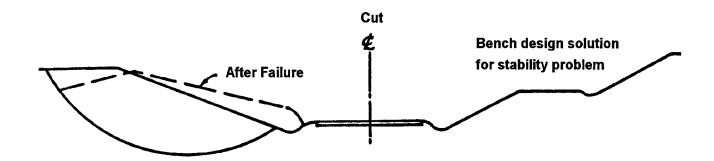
Deep Seated Slope Failure (Left) and Bench Slope Design (Right) to Prevent Slope Failure.
